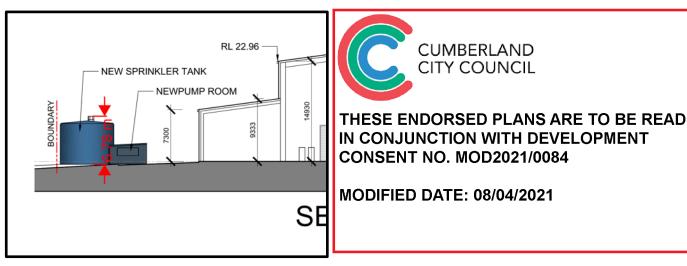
Proposed Height of Sprinkler Tank as Measured on the Architectural Plans (Source: Tim Farrell Pty Ltd, 2021).
